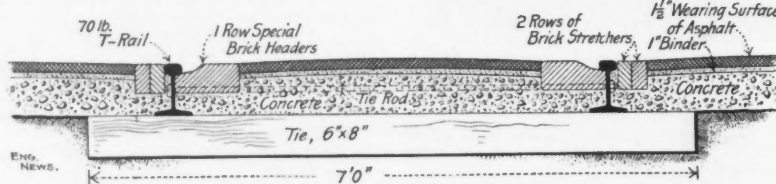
CROSS-SECTION OF STREET RAILWAY TRACK AT SOUTH BEND, IND.
